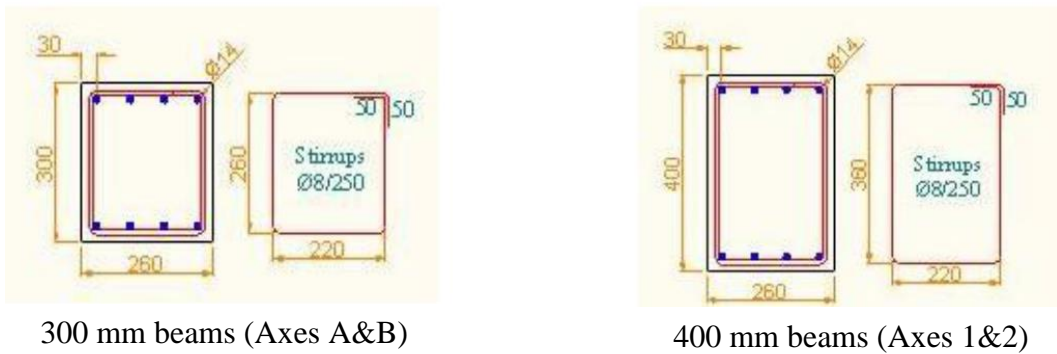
Reinforcement in beams (Unit: mm), (Garcia et al. 2012)
